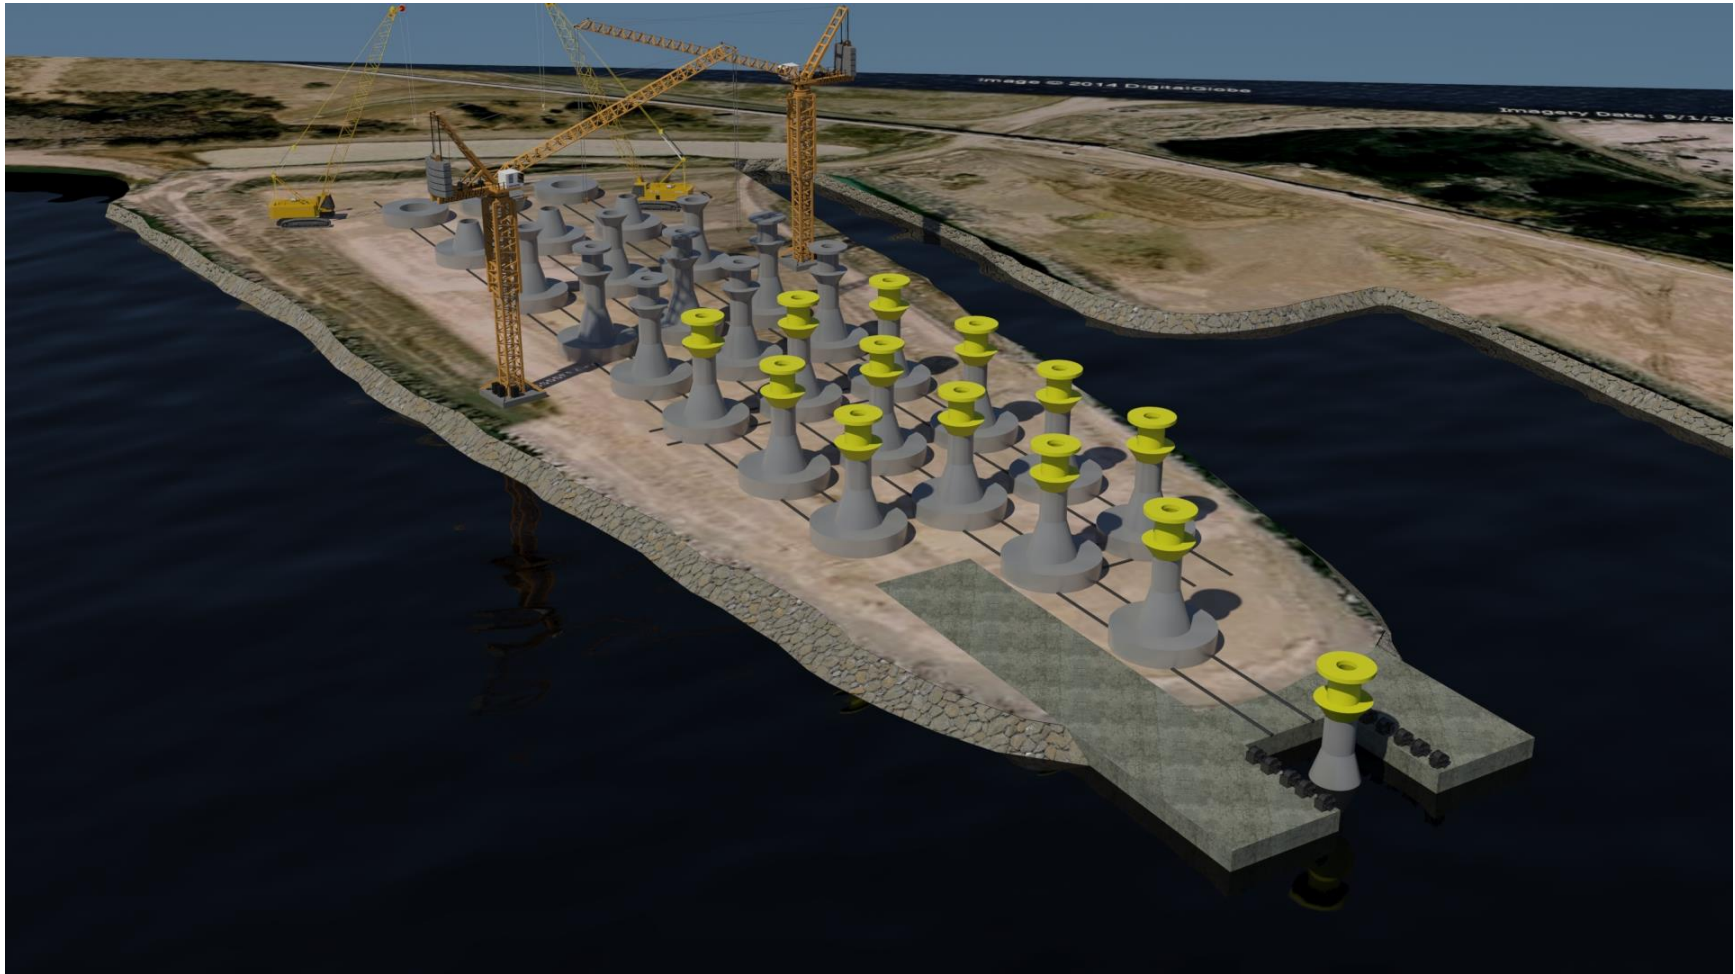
Fabrication Facility with Foundation in Launch Position
